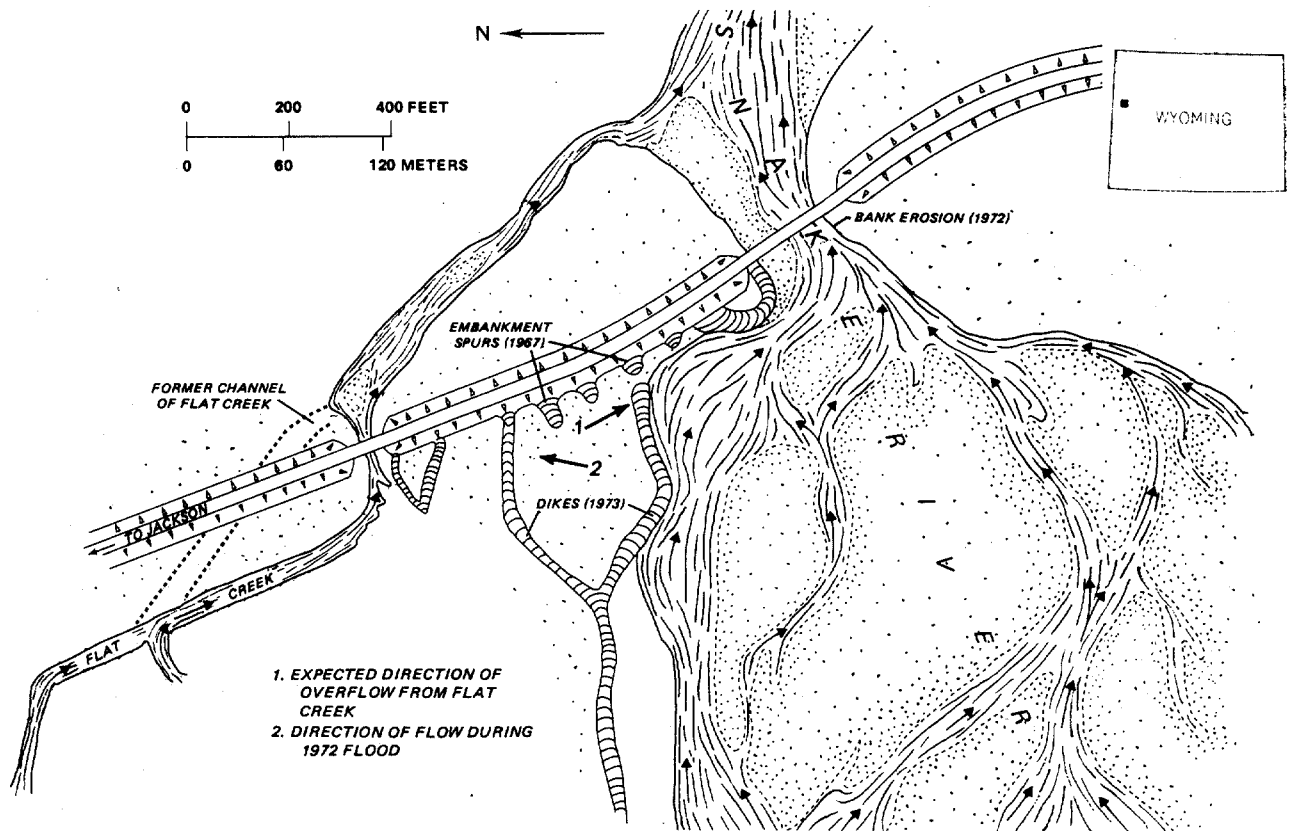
Plan sketch showing direction of overflow between Snake River and Flat Creek at the US-187, 189 bridge, and the use of countermeasures. (From an aerial photograph dated September 5, 1974.)
